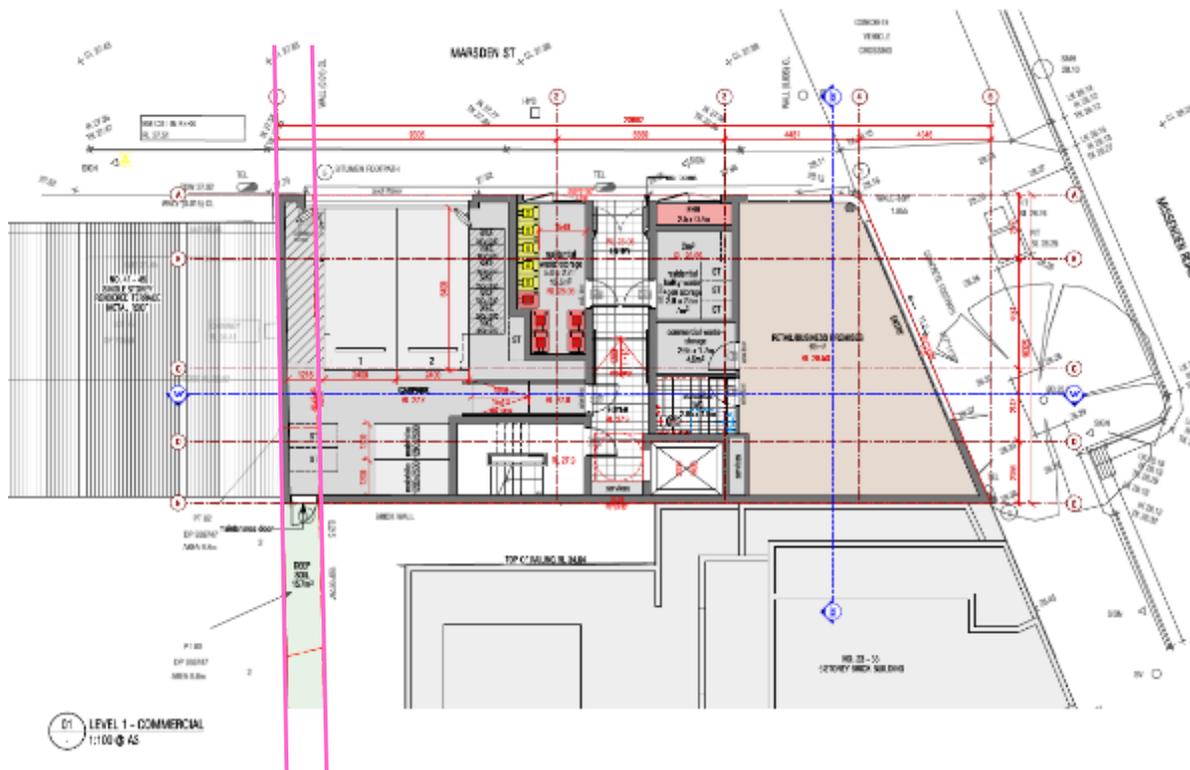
Originally proposed floor plan of the ground floor level (referred to on the plans as Level 1) showing the proposal extending onto the adjacent property at 45A Marsden Street (with boundaries of 45A Marsden Street highlighted in pink)
